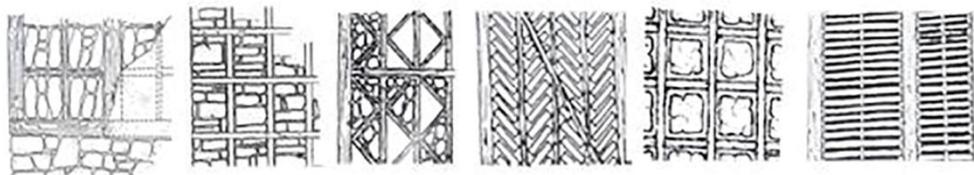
Various types of wall infill systems (Stone, brick, mudbrick, wattle and daub) in timber frame
